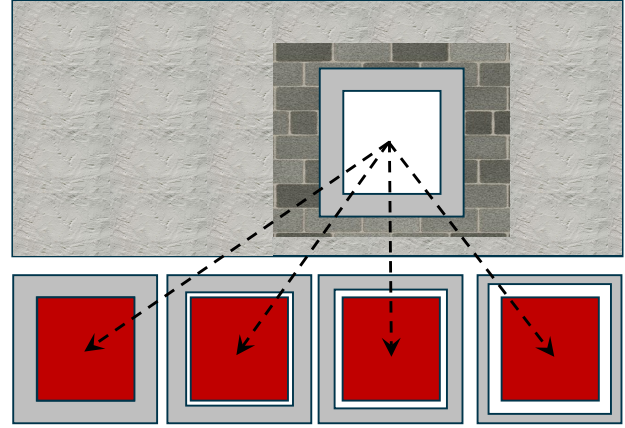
Principle to ensure controlled gap widths of 0, 2, 4 and 8 cm between window and façade wall by using precast concrete frames to mount the dummy window (red).
